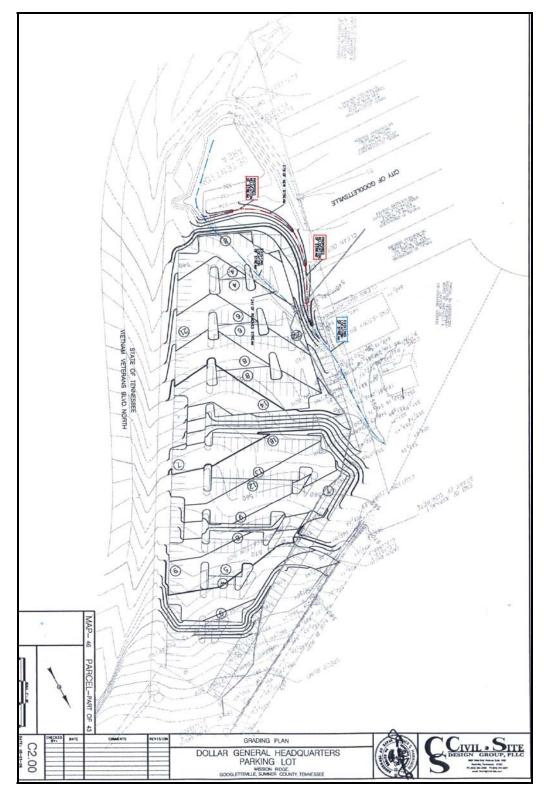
Proposed site plan showing location of existing and proposed stream channel path.
